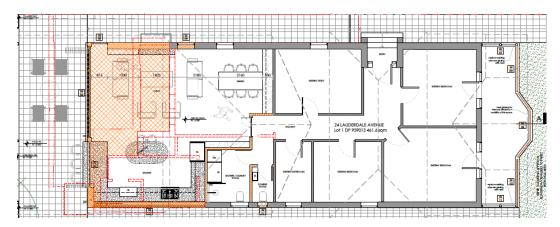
Ground floor plan showing internal and external alterations (Noble Architecture)
